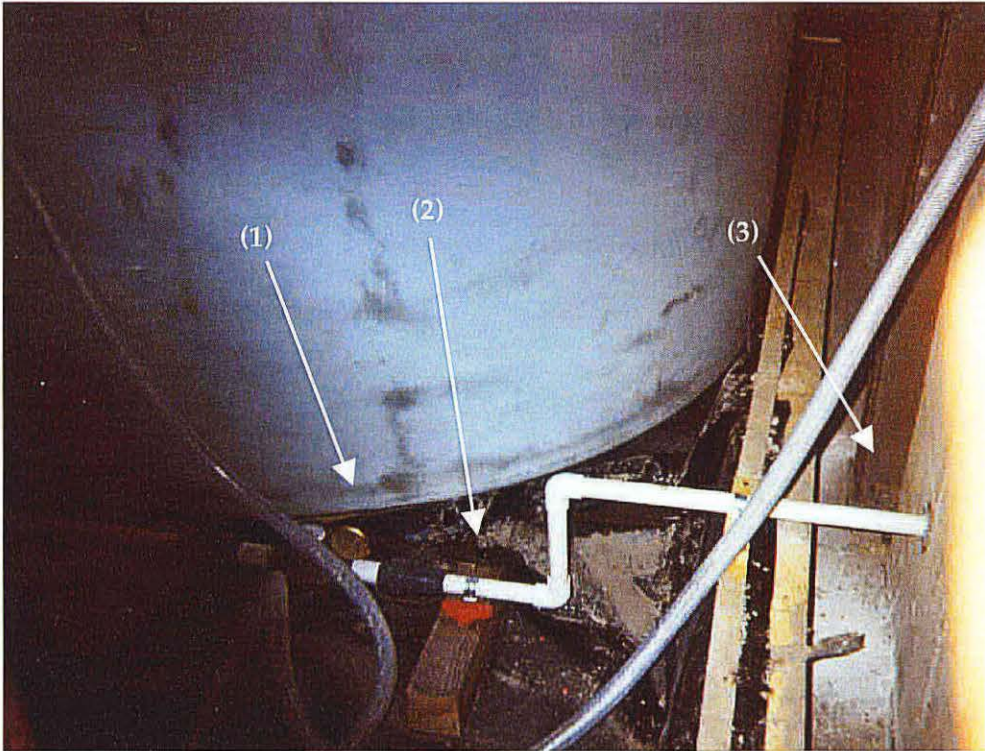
Looking south, picture of the flow meter (1) control valve, (2) and wall junction (3) connecting the indoor and outdoor piping.
